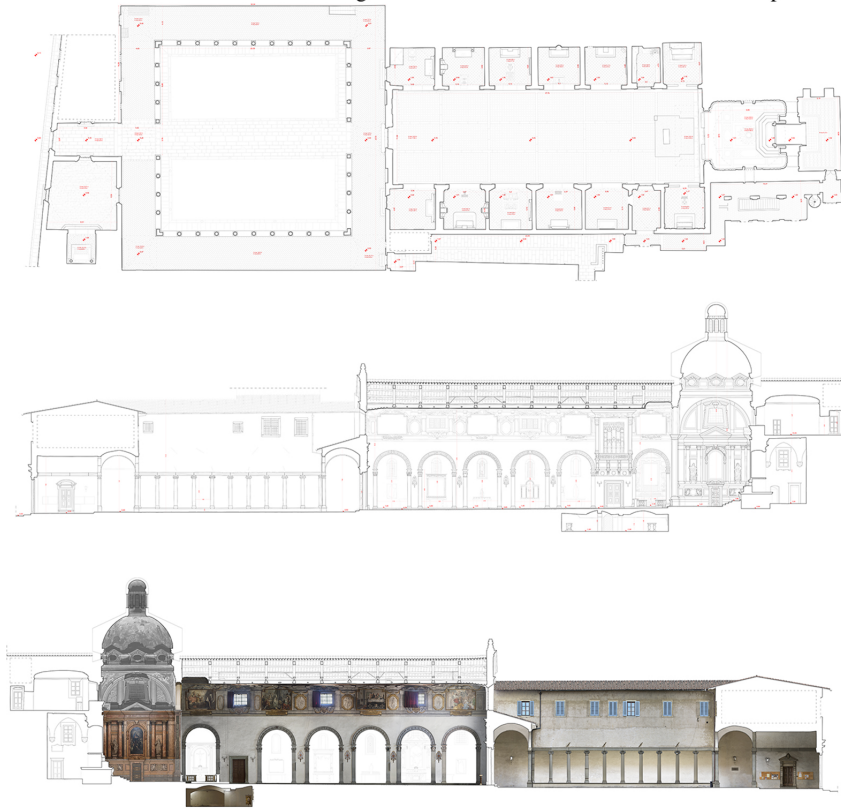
Final 2D drawings: (Top) general plan of the complex, (Middle) wireframe restitution of a longitudinal section and (Bottom) opposite section with photoplan.
